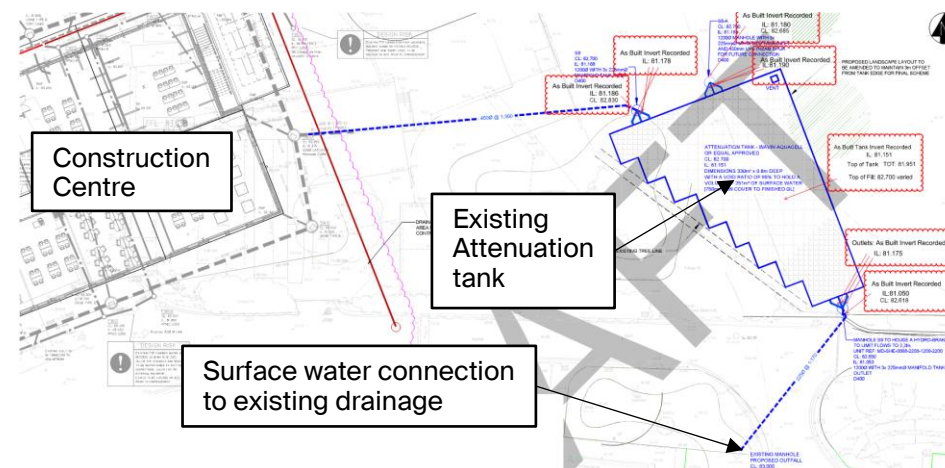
Extract from MLM Group as-built information serving the Homestead and Teaching Buildings presenting end of line attenuation tank and swale and connection to existing surface water drainage
